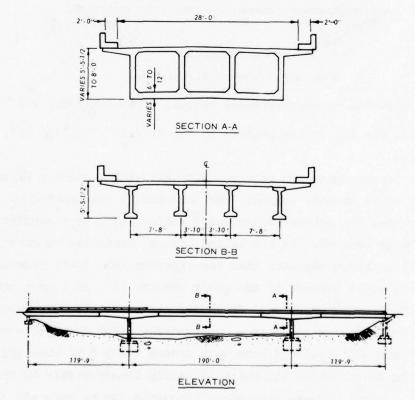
Elevation and sections of the bridge superstructure (from Reference 24)
